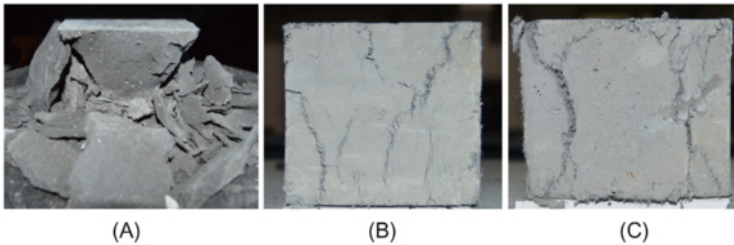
Concrete samples after uniaxial compression test: (A) plain concrete, (B) UHMWPE concrete, and (C) hybrid-fiber concrete.
